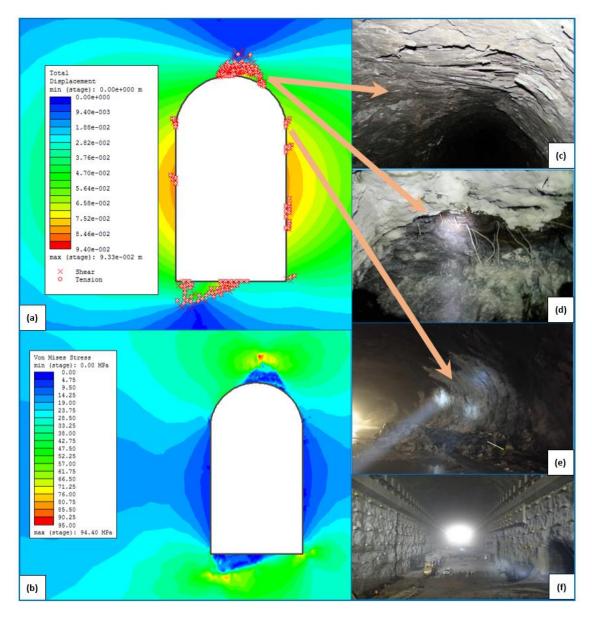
Design analysis for ground management by numerical modelling; (a) displacement of rock mass (b) distribution of stress surrounding excavation, (c) failure at crown before installing first layer of shotcrete and rock bolts, (d) failure at crow after installing ground support, (e) failure at a side crown, (f) underground excavation after installing ground support system.
